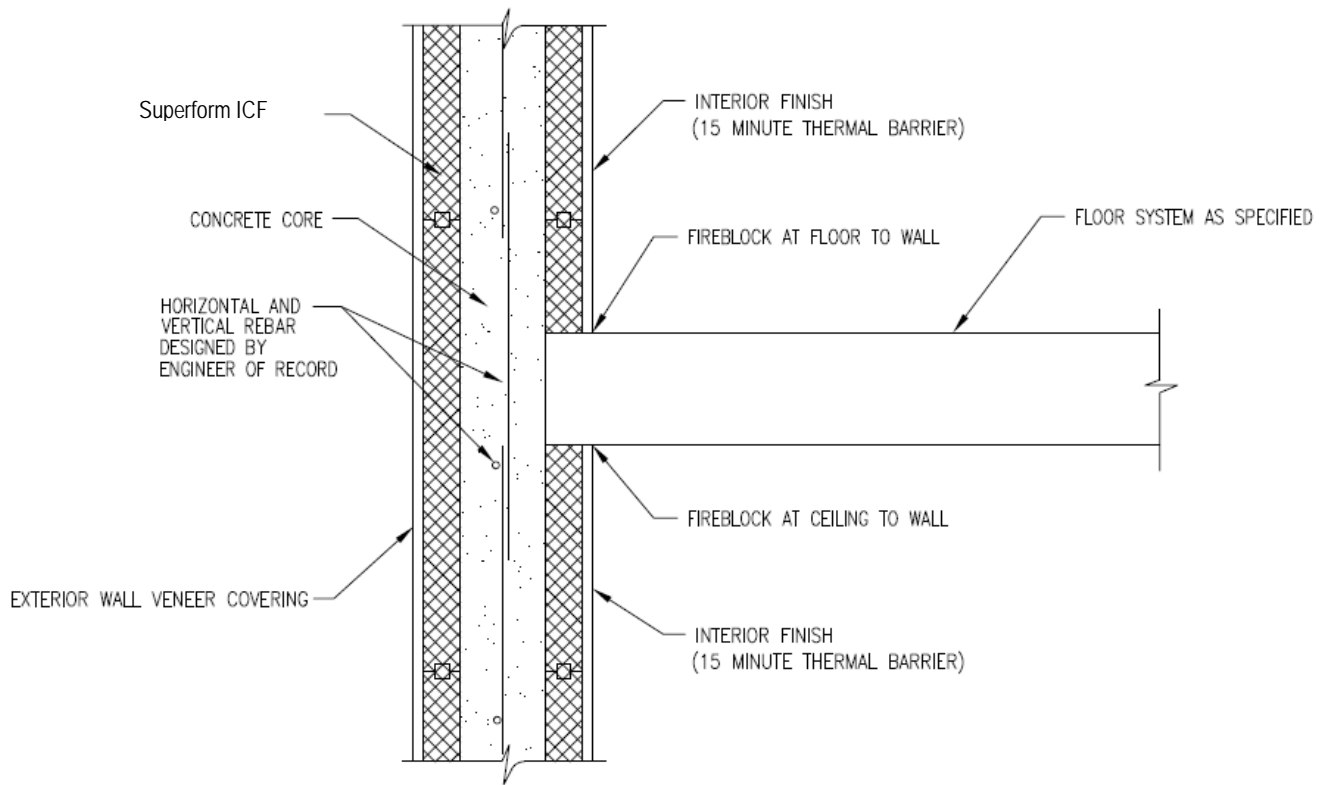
TYPICAL WALL-TO-FLOOR INTERSECTION FOR TYPES I, II, III AND IV CONSTRUCTION (IBC)
